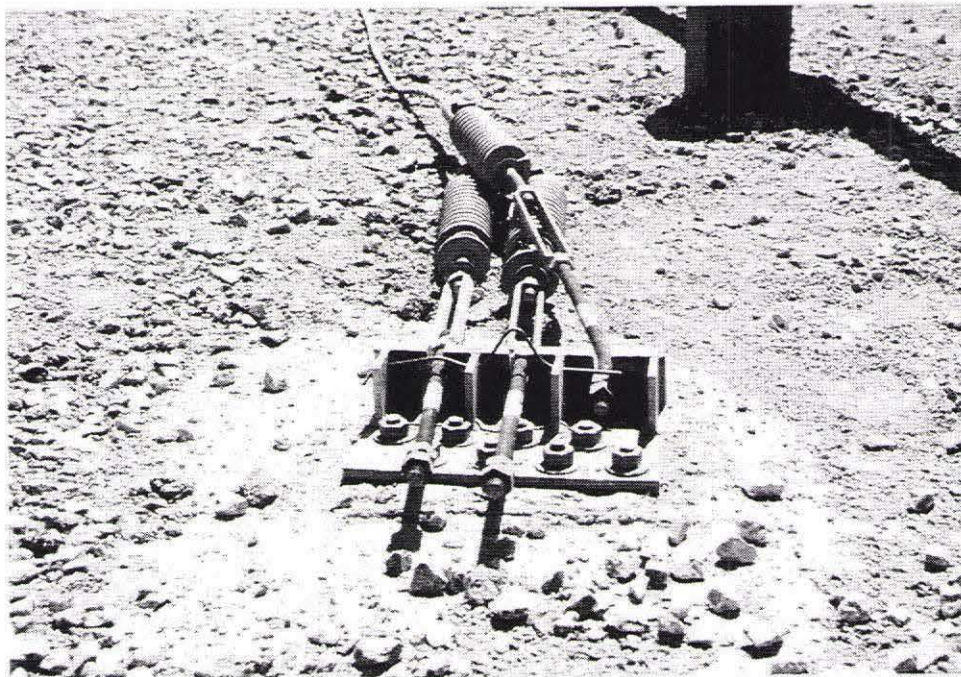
Downstream Cable Anchorage Damage, Test SDC-2
